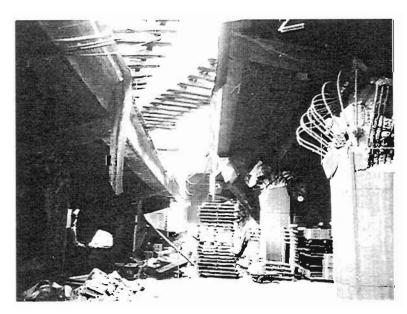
Collapsed infill slab due to buffeting between viaduct and warehouse
